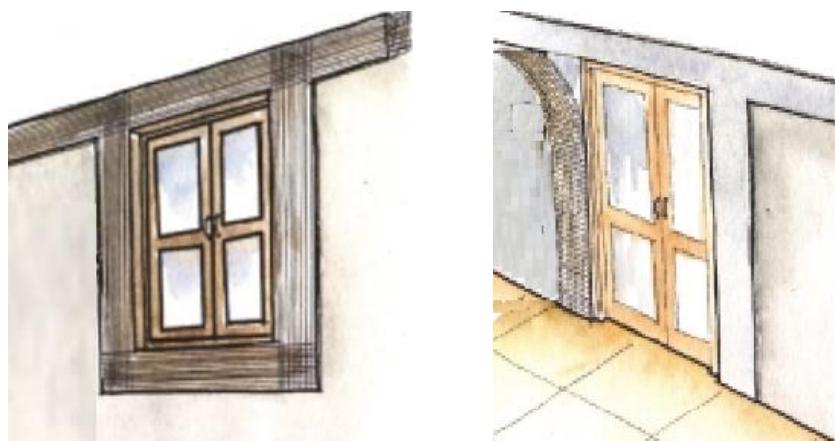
Encasing around window and door openings (source: UNDP, UNECO & GOI, 2007)
